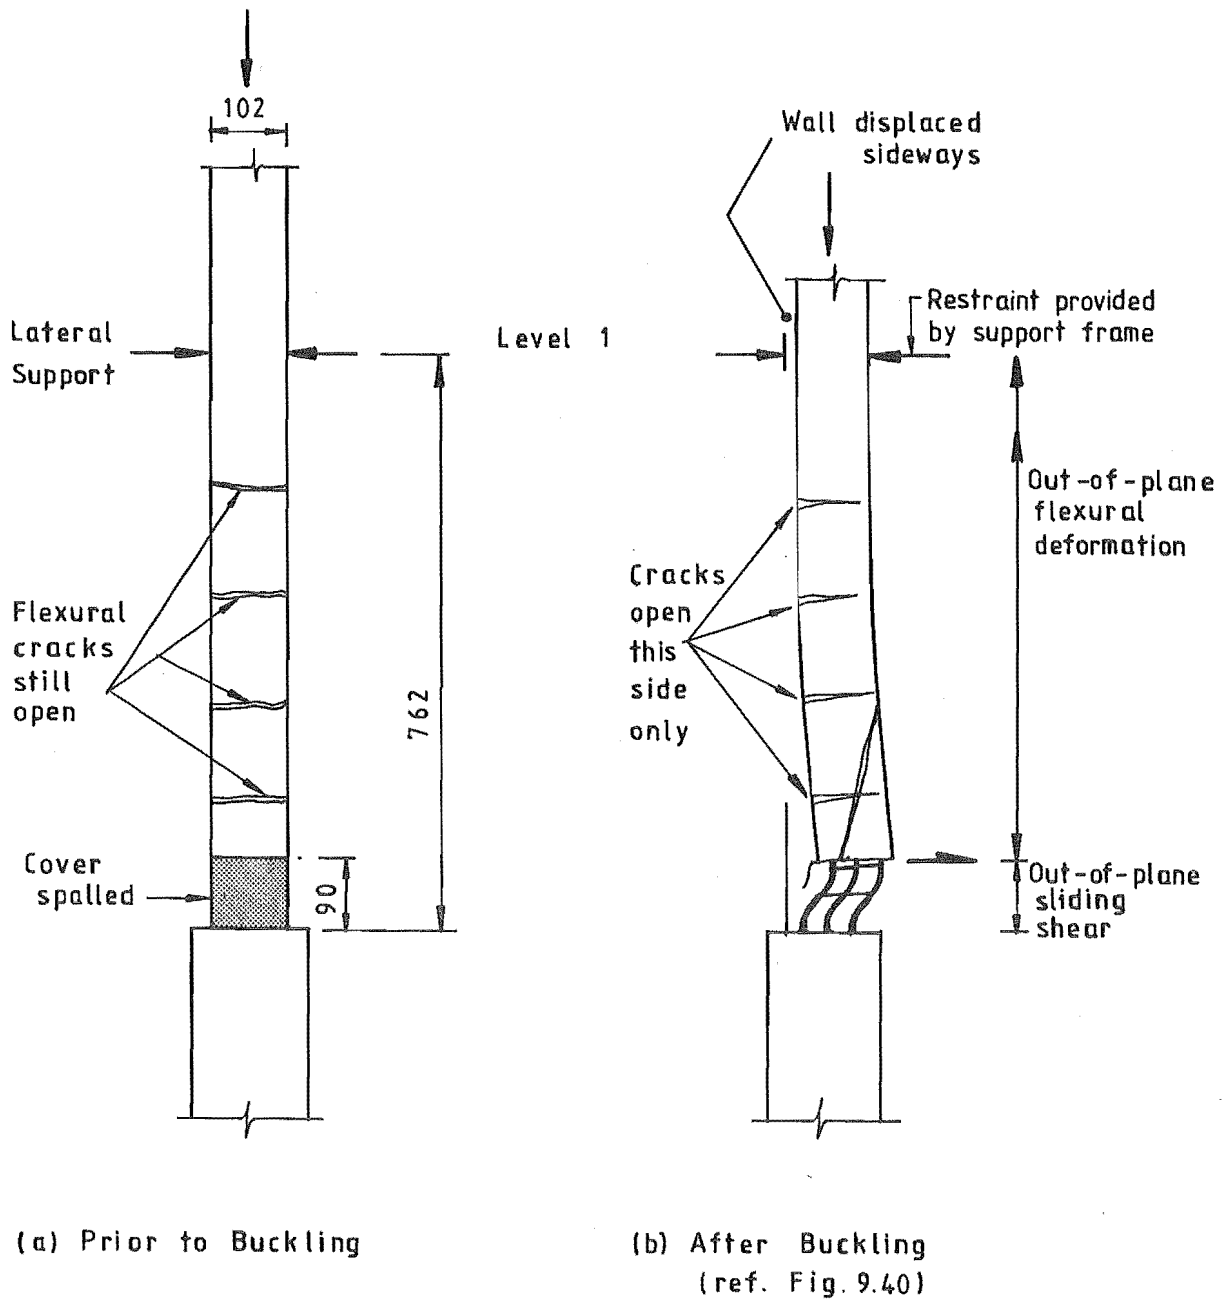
MECHANISM OF BUCKLING FAILURE, FSW-2 WALL COMPRESSION BLOCK (SCHEMATIC ONLY)
